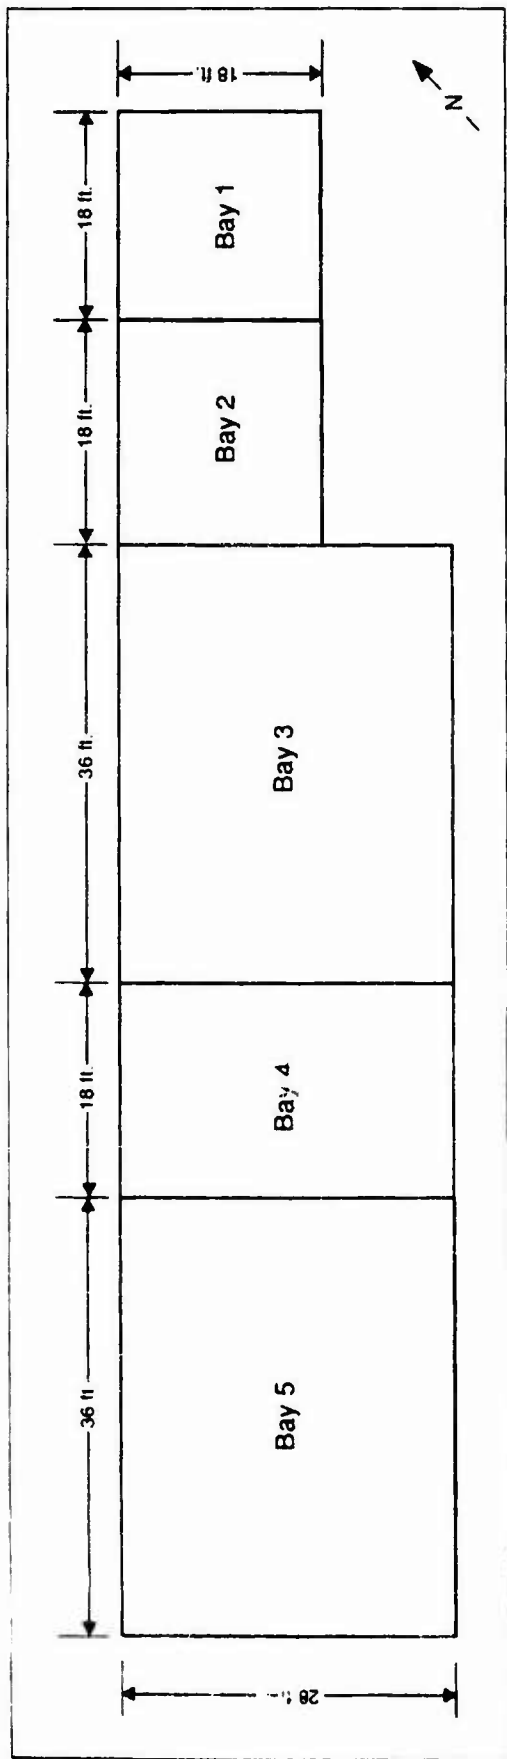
Floor Plan for Building 3100 (Source: Adapted from Foster Wheeler 1988b)
